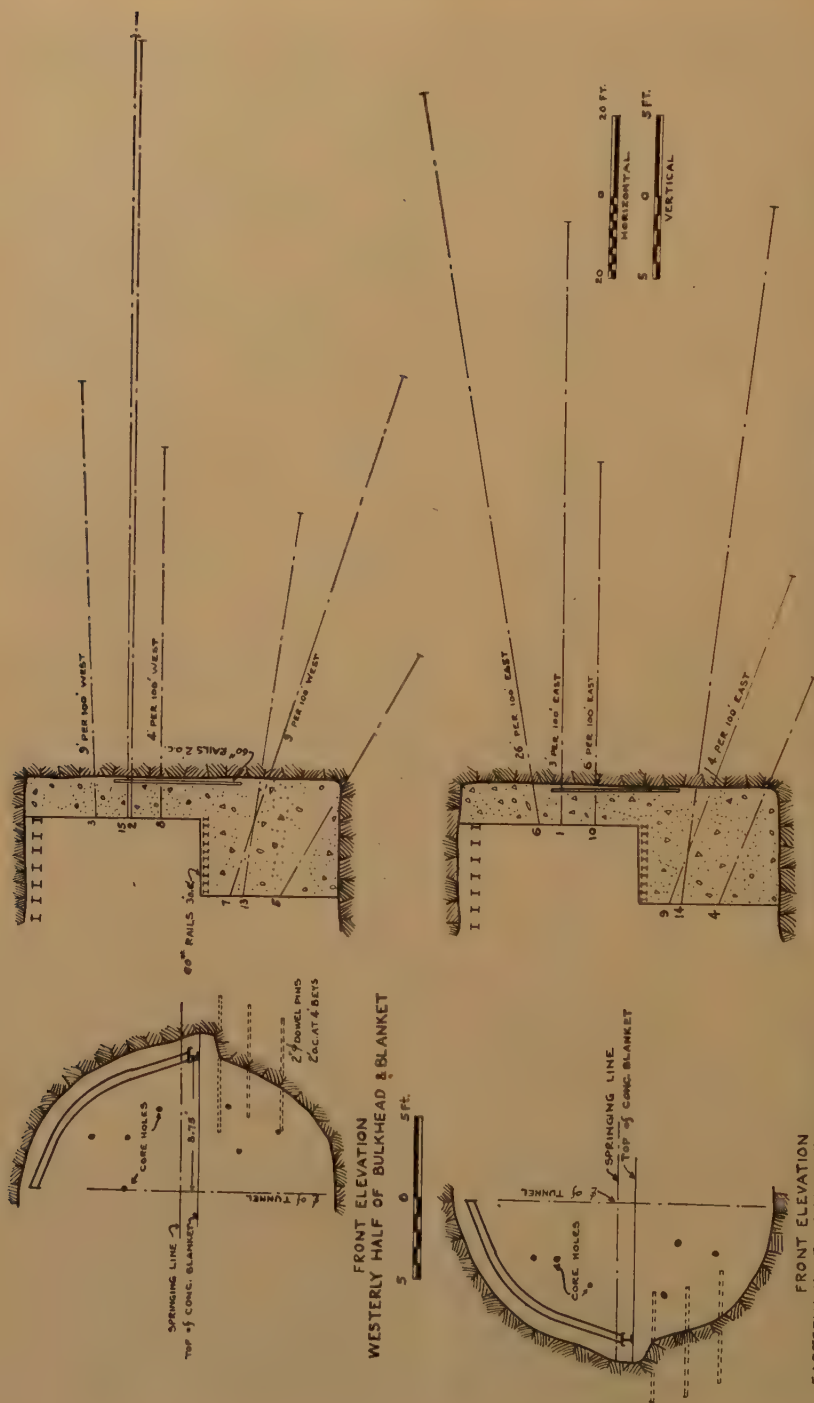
FRONT AND SIDE ELEVATIONS SHOWING DETAILS OF CORE BORINGS IN VICINITY OF BLANKET AND HEADING BULKHEAD.
